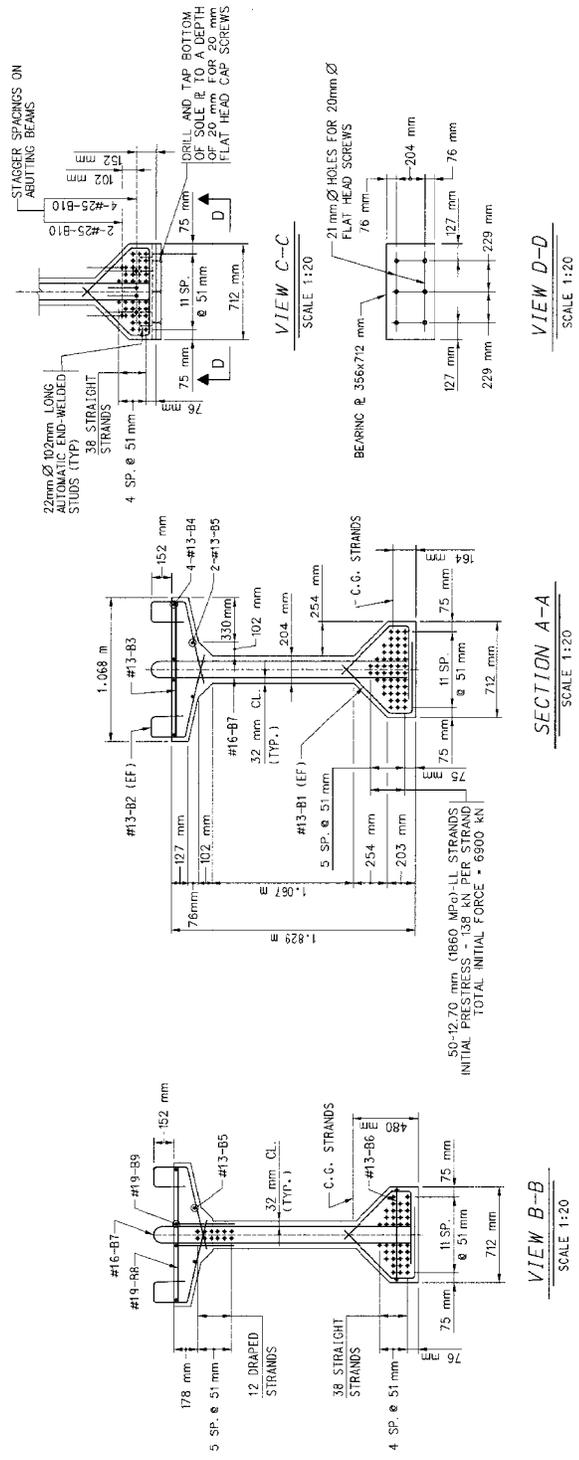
Beams B1 thru B12 Sections and Views (1/2)
